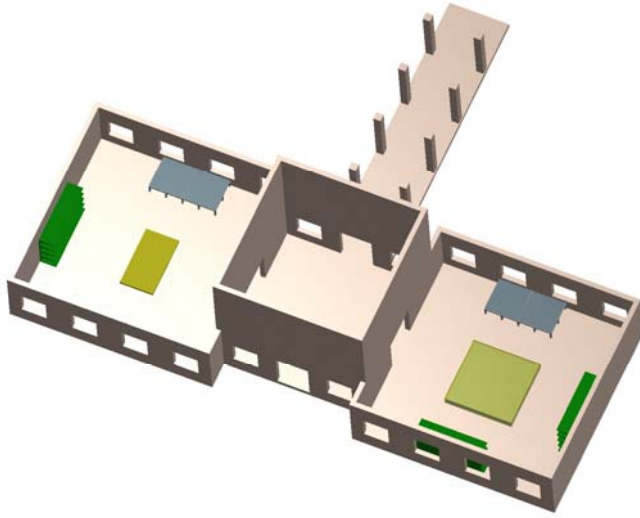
A draft ECAL assembly area layout for one of the options at IIT Guwahati.
